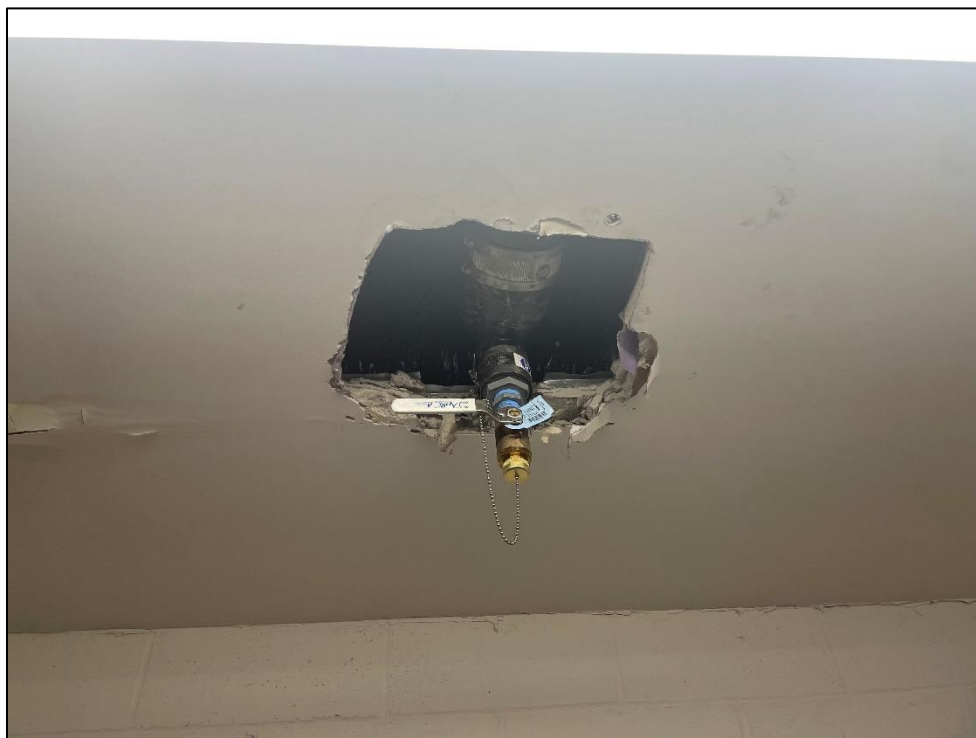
, 05/17/2023: View of the clean out valve installed to remove water from the SMD system (facing west).
